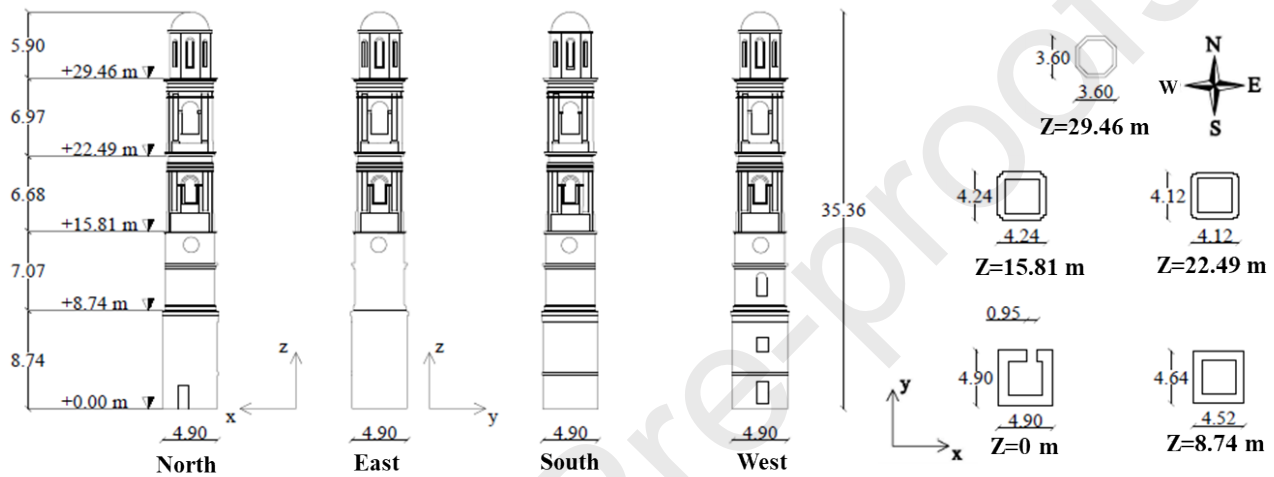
Tower 5. Elevation views, plan and relevant sections of the bell tower with indication of the main geometrical dimensions.
